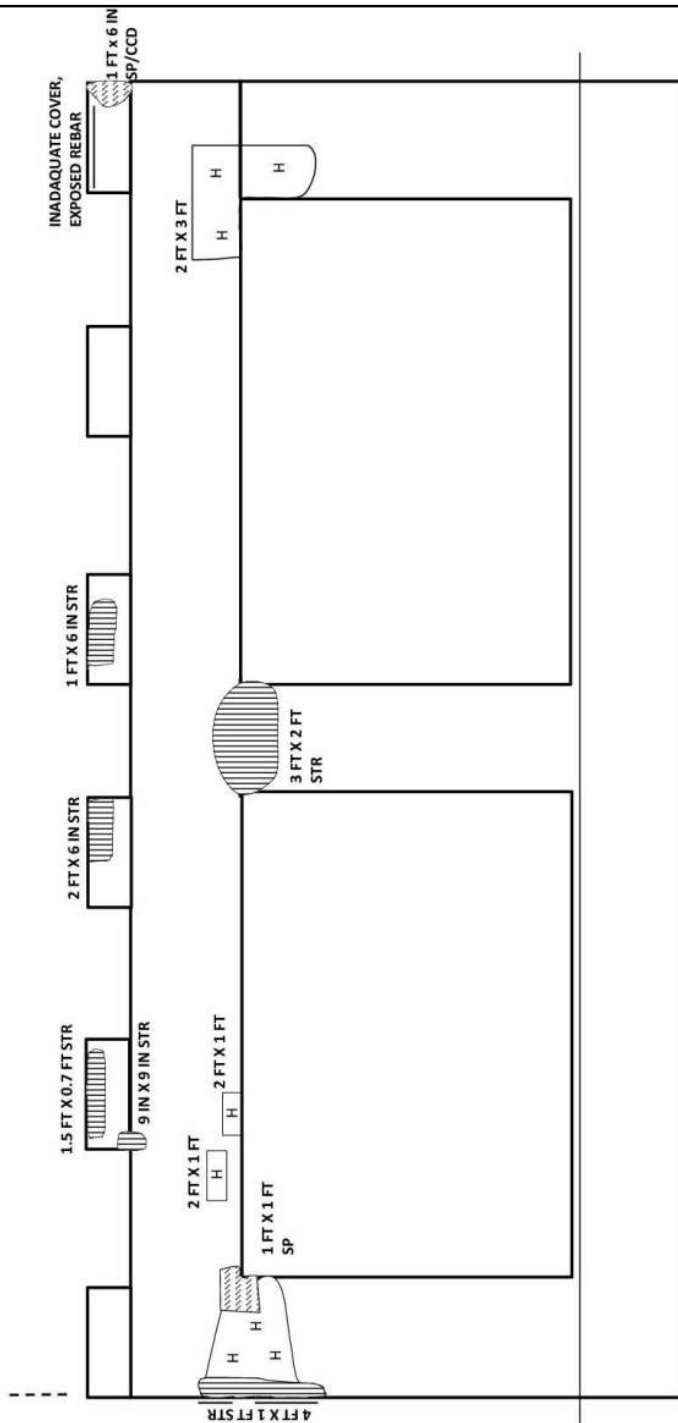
Sketch Filename: 22-1022609-Pier_2_Deterioraton3.jpg
